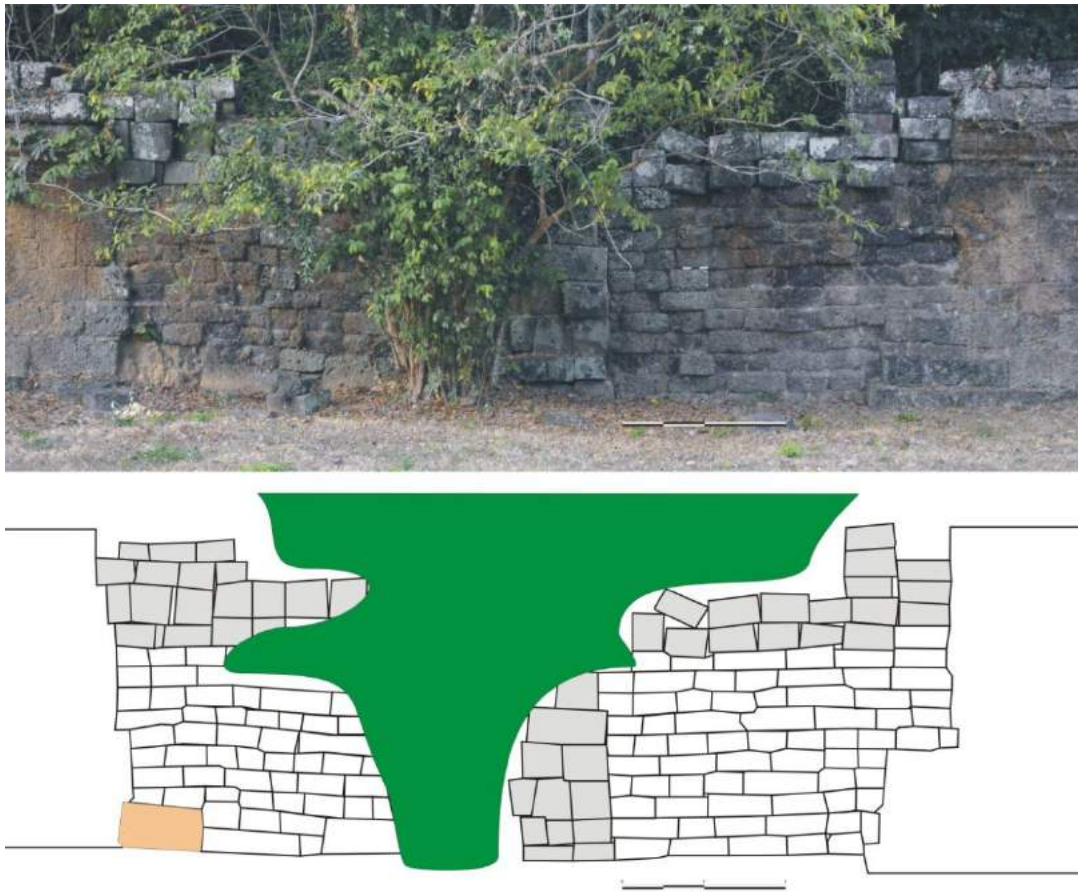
Photo and masonry pattern of the West gateway on the South wall – sandstone (grey), laterite (white), foliage (green) and termite mound (beige)
